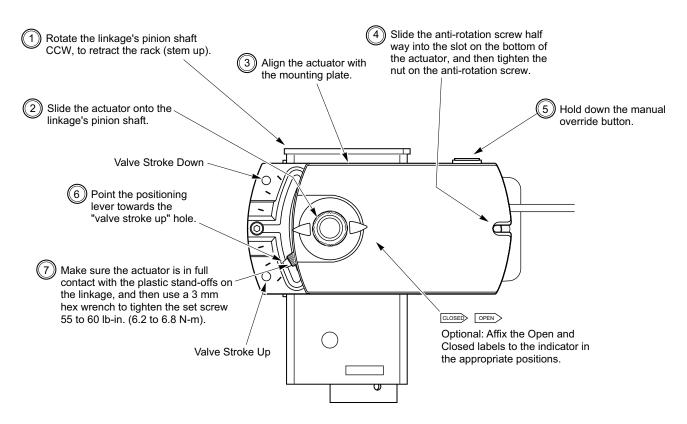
Mounting MX41-6043 and MX-41-6083 Actuators and Setting up Actuator/Linkage/Valve Assemblies.
